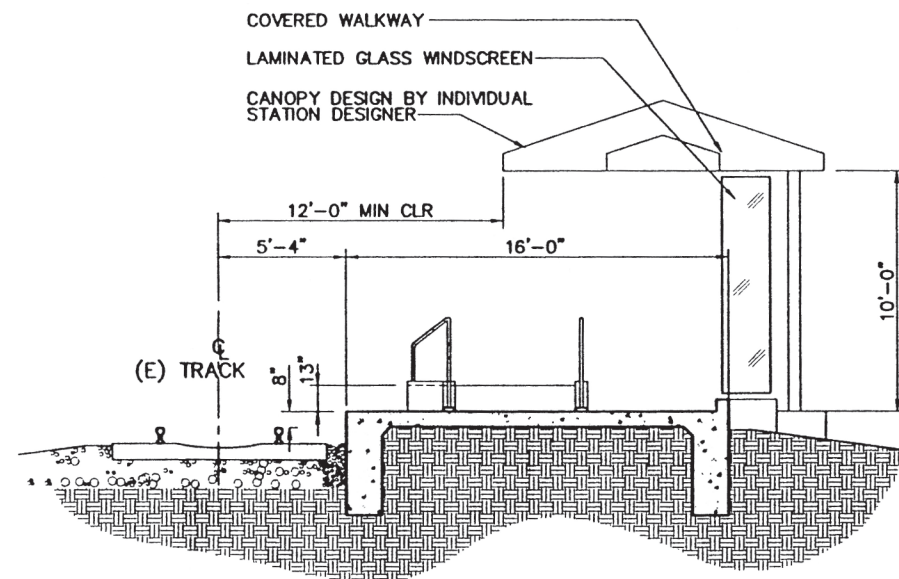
Sample Sounder Station Plans - Platform Details, Drawings 4 & 9 Tactile Warning Surface
